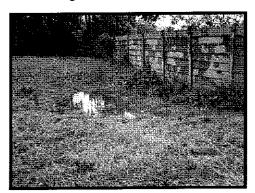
Ponding noted on Site (adjacent to 157/ 159 Whalley Road
